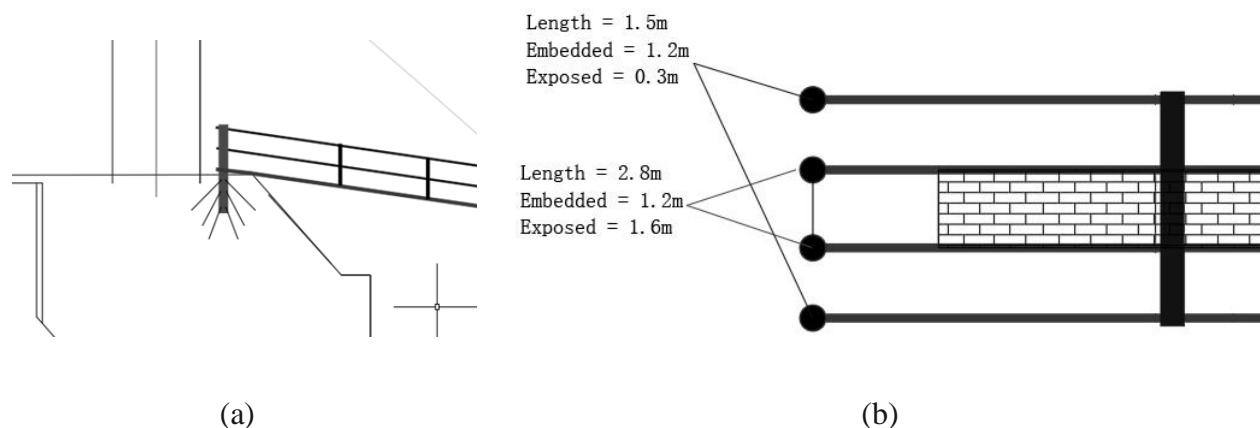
The structure of anchor block for the entry port of Baifu river cable bridge
